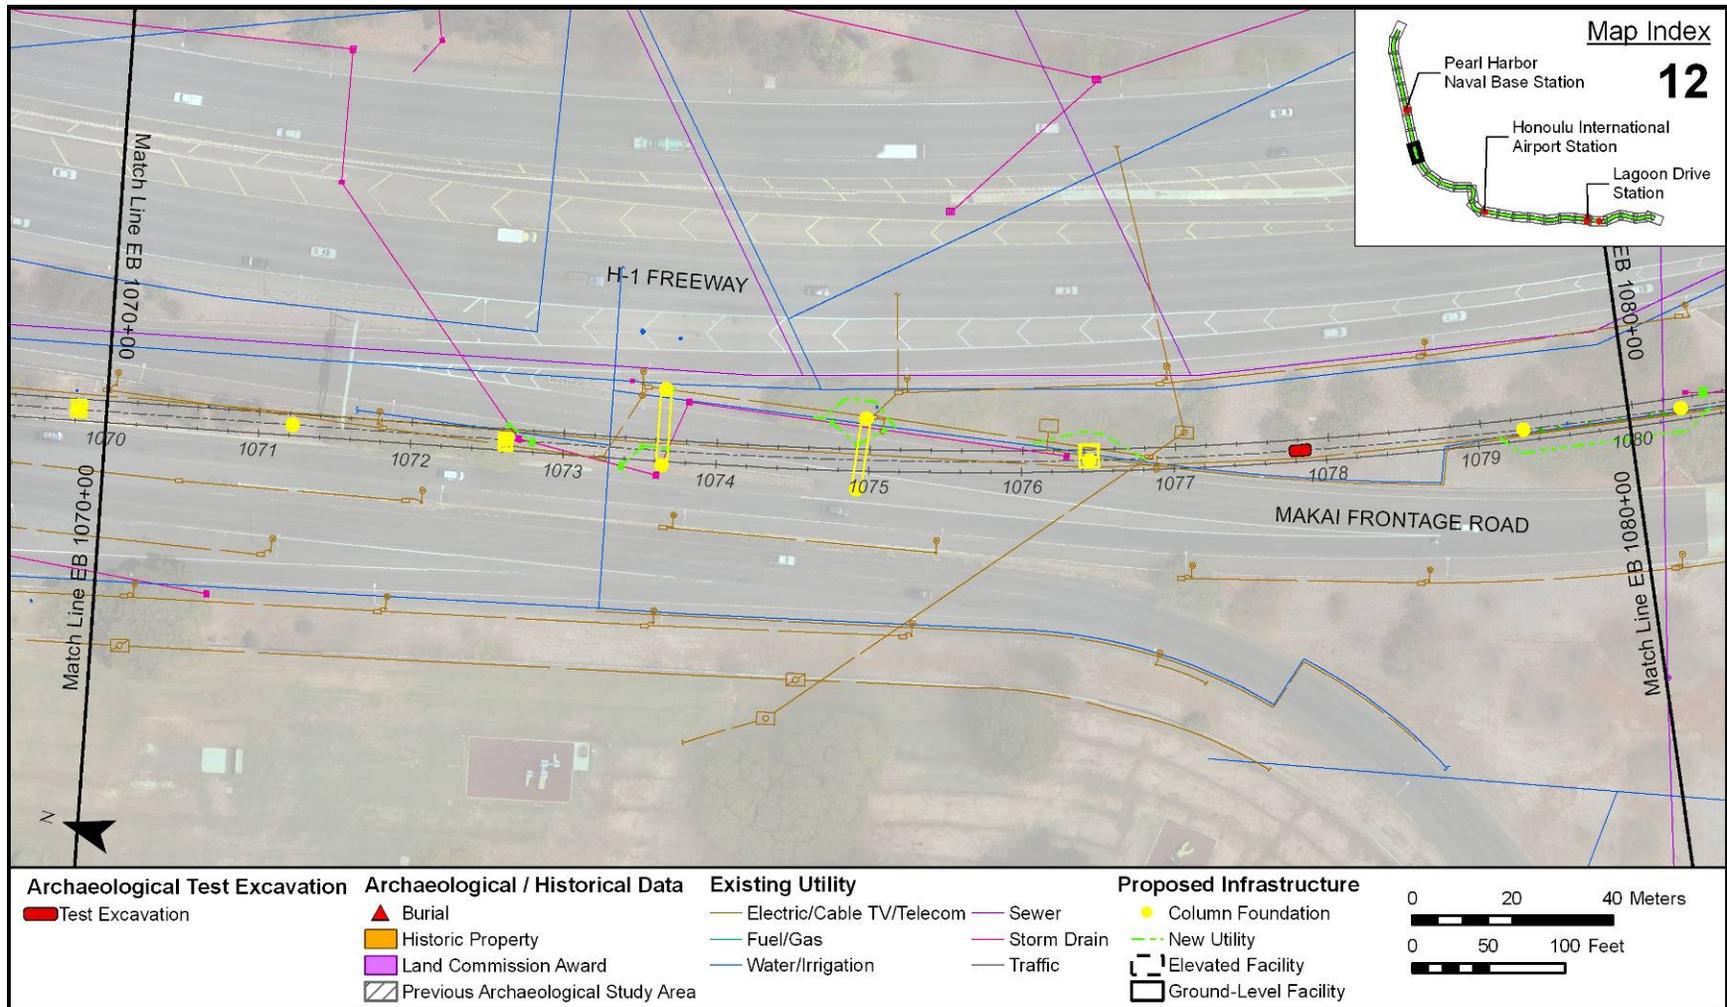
Map Sheet J 12, one 10x3 excavation at column foundation @ 1077+80
